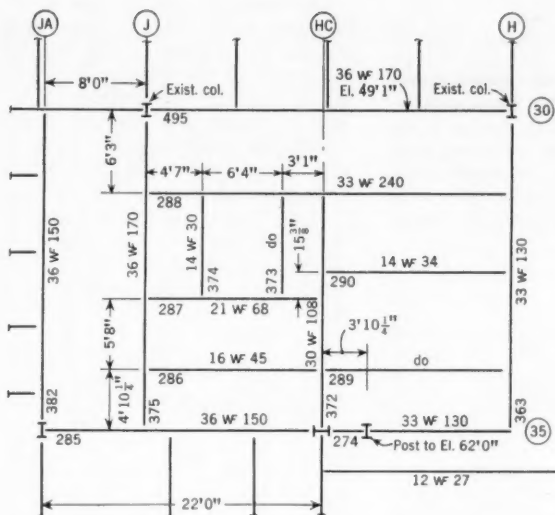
A system of numbering for beams and columns tells the computer the geometrical configuration of the framing. Shown here is a plan view of structural steel at El. 50 for a building designed with the aid of a computer. Each member is numbered in conformity with the IBM listing.
